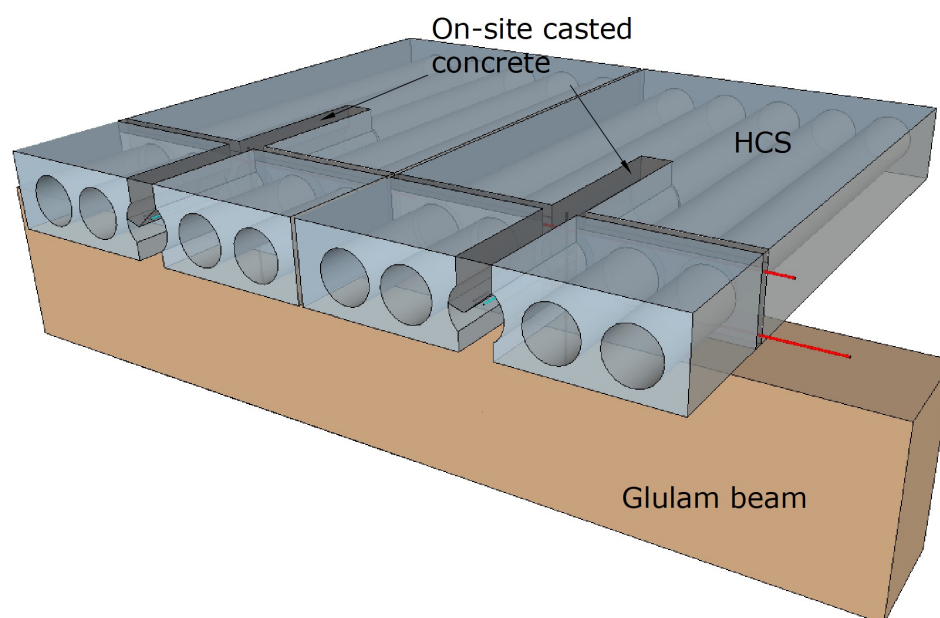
3D view of proposed conceptual design for connection of HCS to a timber frame.
